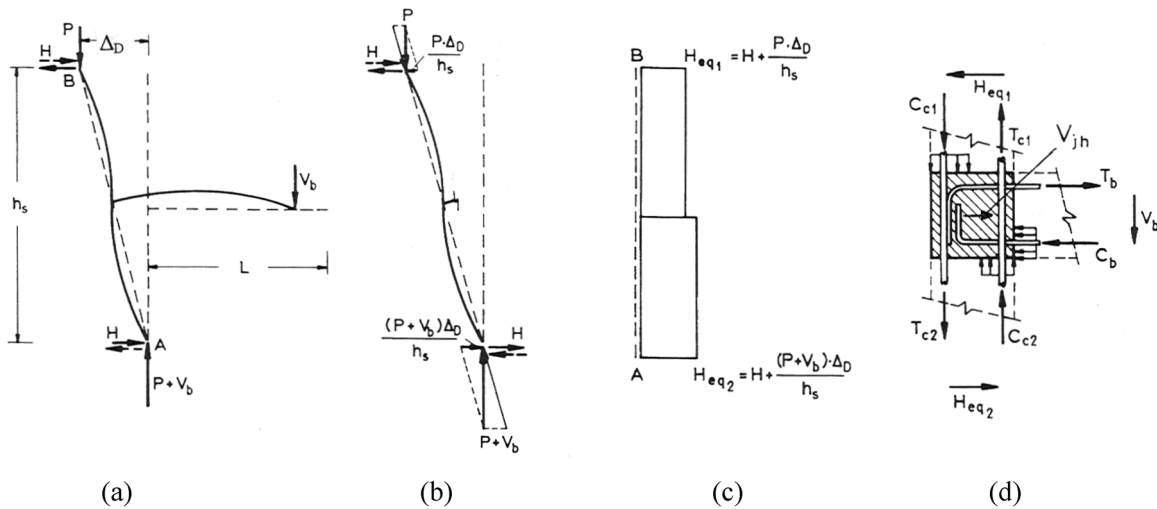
(a) Exterior beam-column subassemblage of sway reinforced frame subjected to seismic loading showing the imposed forces, (b) Inclined and horizontal components of the columns' axial load, (c) Diagram of columns' shear forces, (d) Free body diagram for exterior beam-column joint of sway reinforced concrete frame
